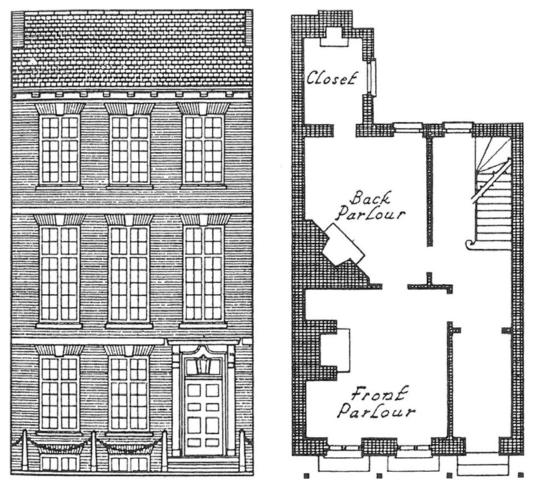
Typical house c. 1670-1700, with casement windows and eaves cornice, as illustrated in Summerson, 2003
